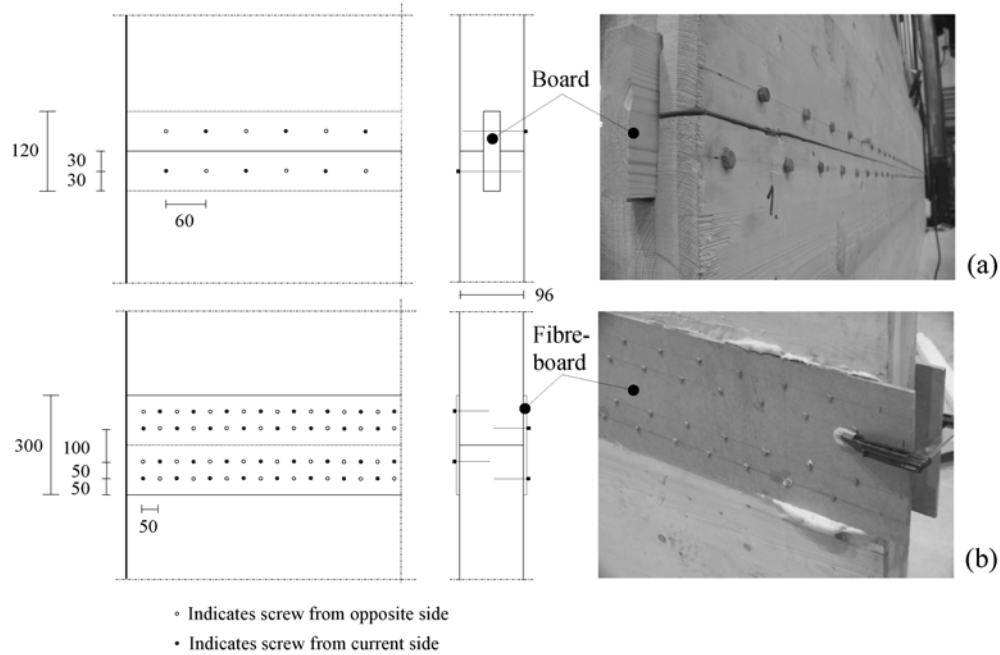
Joints of the longitudinal wall-elements: (a) element 5 with a sawn board screwed to the parts of the element and (b) element 6 with fiberboard sheets glued and screwed to the parts of the element.
